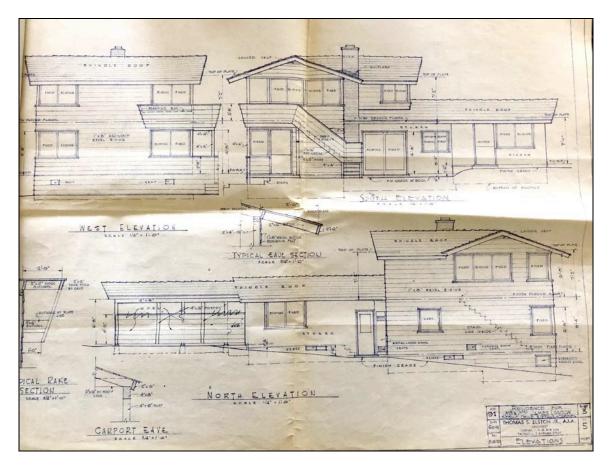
Photograph of original Thomas Elston elevations from the Carmel-by-the-Sea planning department files.
